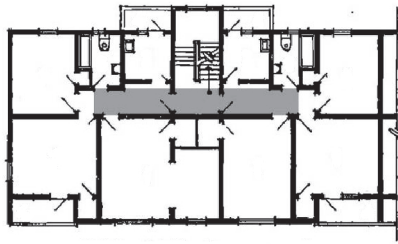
Typical floor plan in Taoyuan New Village, late 1950s (Source: Lue et al., 2001)
